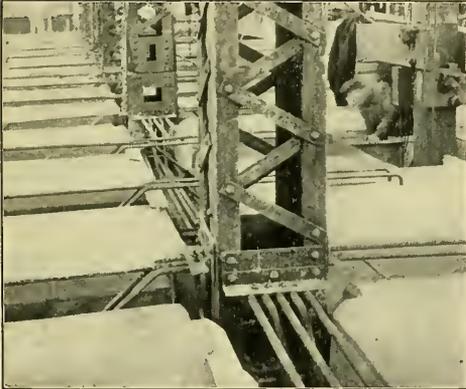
METHOD OF SECURING REINFORCEMENT.
